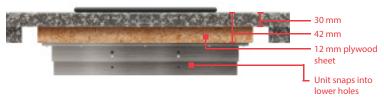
Incogneeto™ Unit Mounted to 30 mm Countertop with Plywood Sheet
